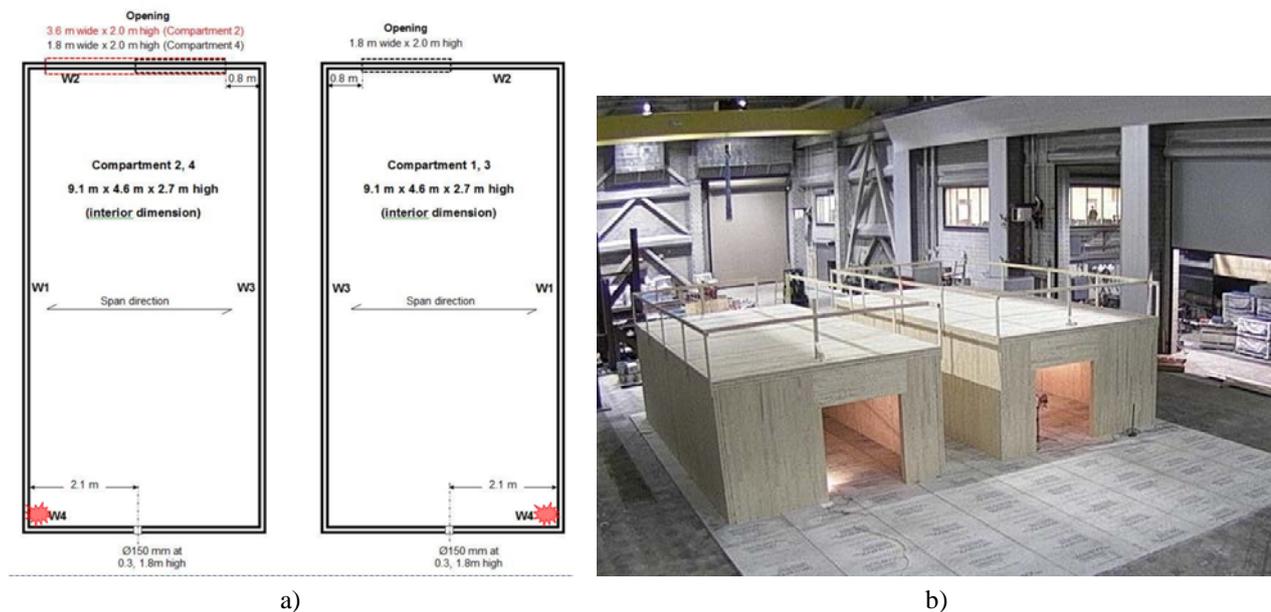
a) Plan view schematic of test compartments; b) Photograph of test compartments (bare structure)
